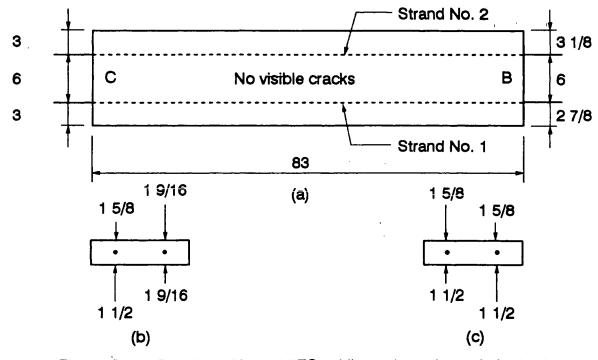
Specimen No. 3-3.0TC-4 (dimensions shown in inches):
